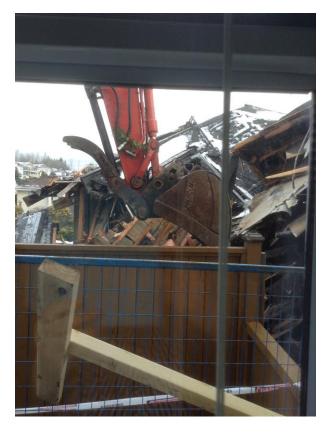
Construction fence and brace that was illegally placed on our walkway through our gate resulting in a broken window.
